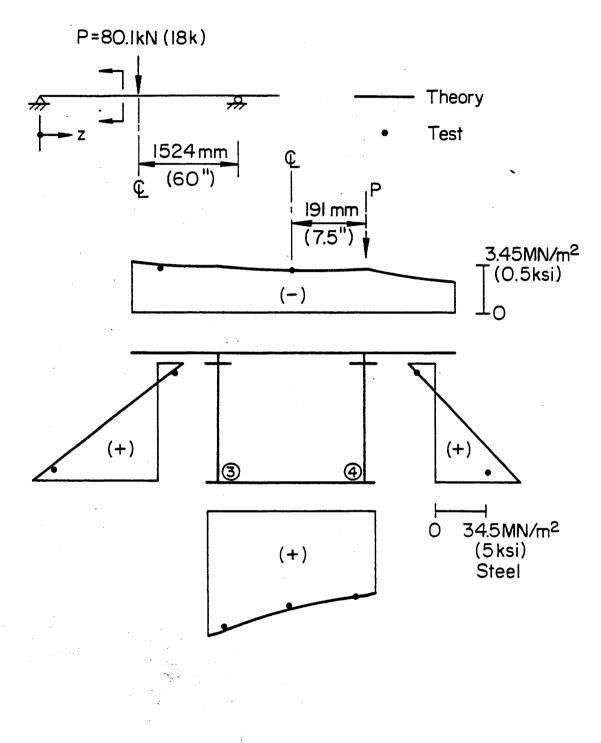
Normal Stresses in the Cross Section of Girder D2 at Z = 1397 mm (55 in.)
